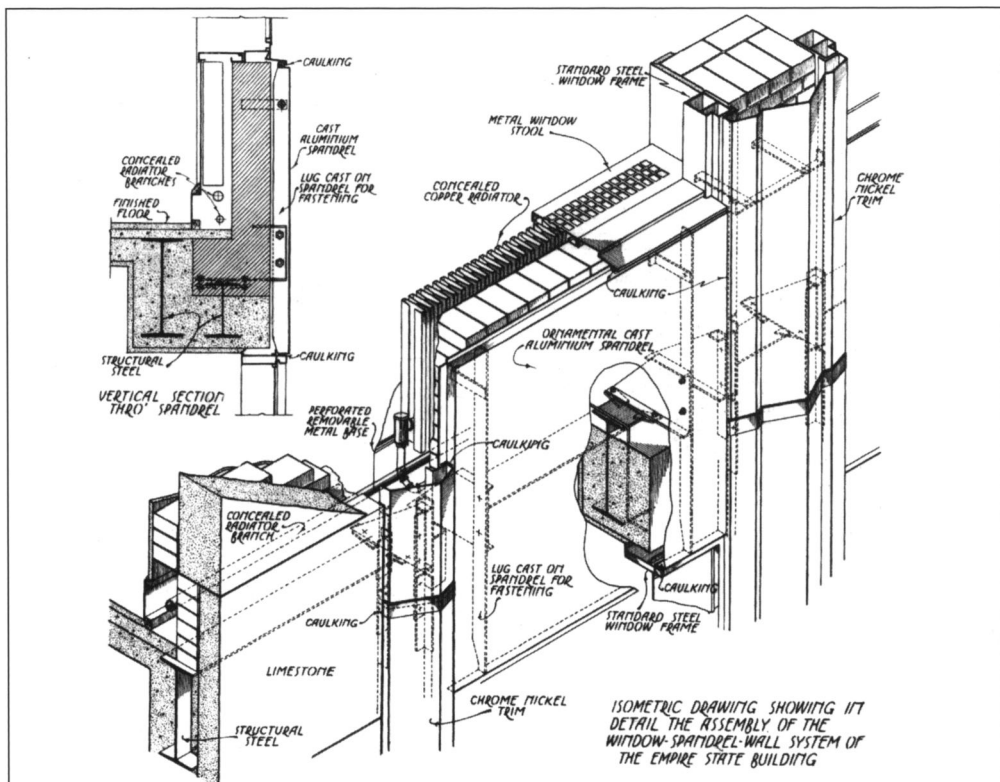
Wall details of the Empire State Building, New York (from *Engineering News Record*, 1931).
